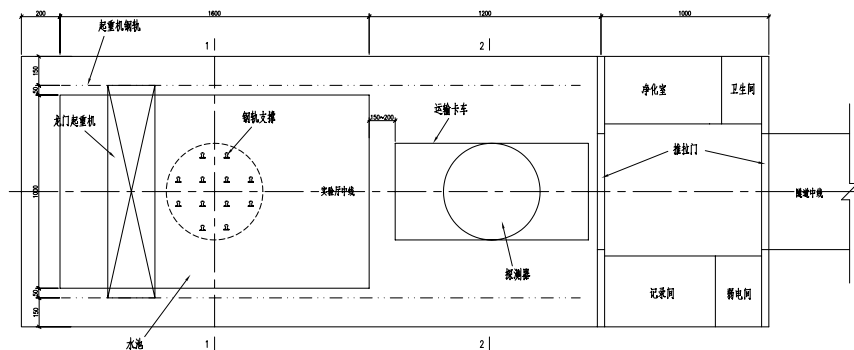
Layout of the experimental hall where the counting room, etc., are laid out in series along the hall (as proposed by TSY).
